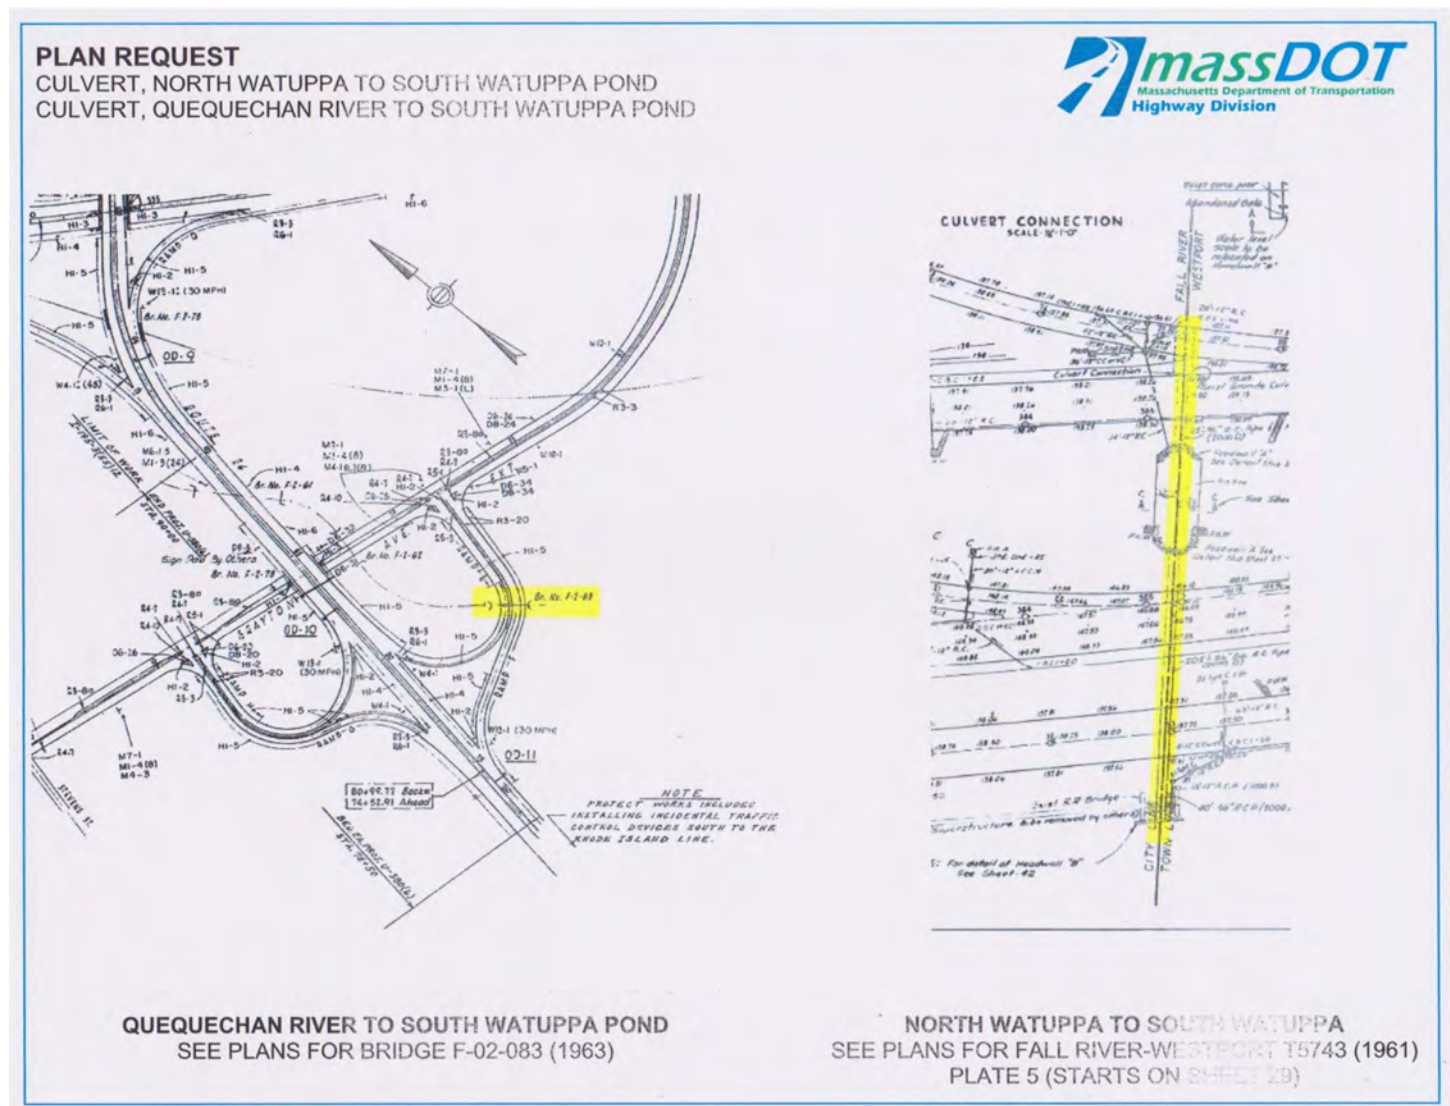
Rt. 1961 Drawing of the River 24 Box Culvert/S. Watuppa Pond Outlet and Rt. 195/Narrows Gatehouse/ North Watuppa Pond to South Watuppa Pond Culvert
